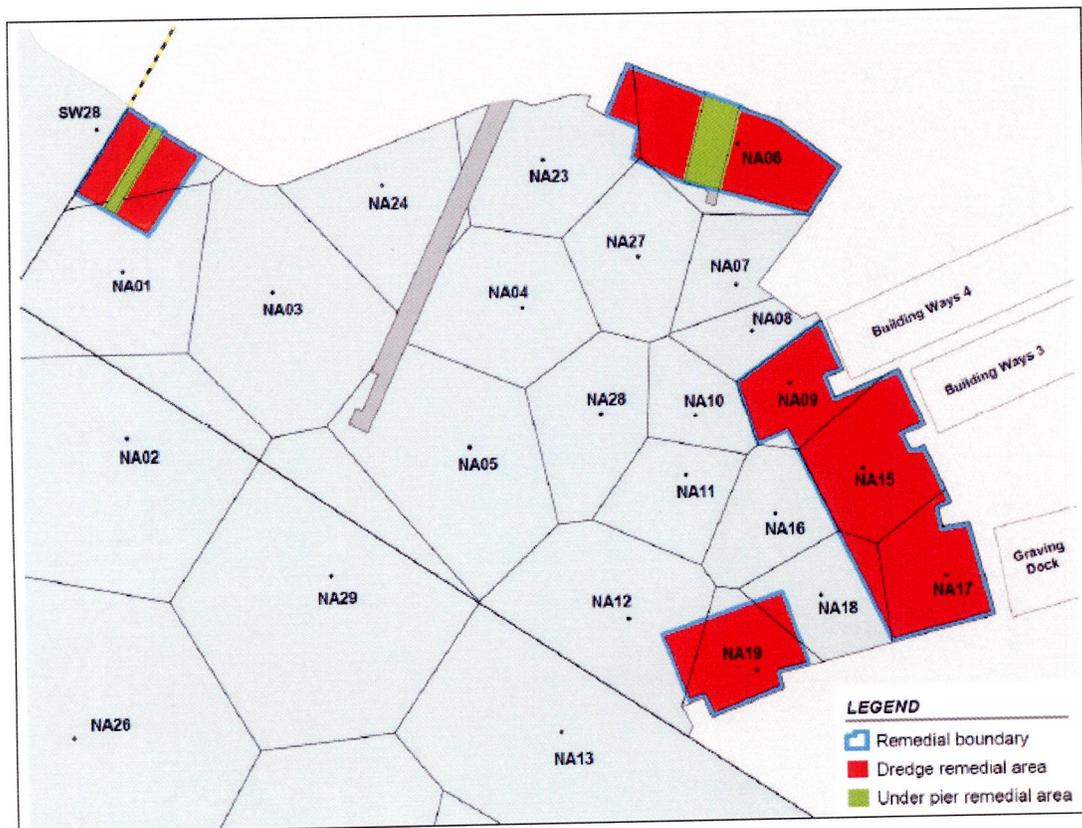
South Shipyard Proposed Dredging and Under Pier Remediation Areas
